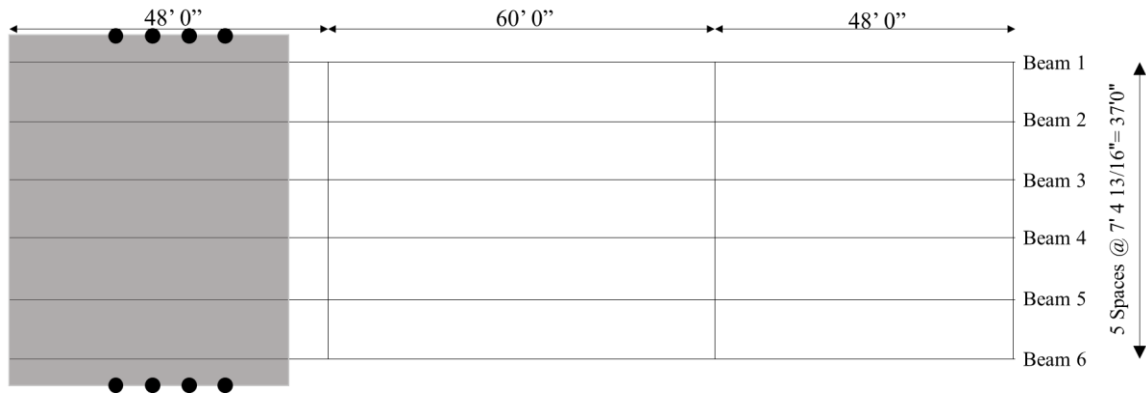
Span 1 vehicle and wet concrete load for 160 ft Standard Bridge
